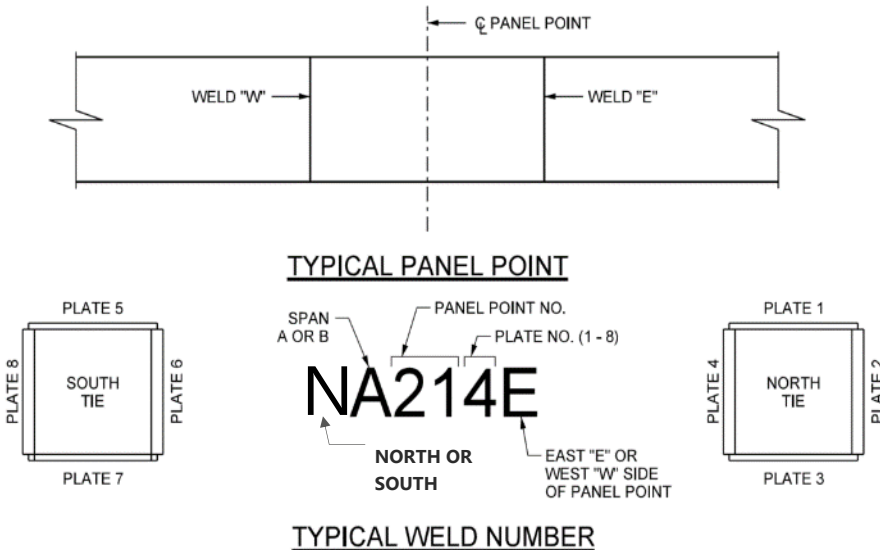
Identification of tie plates and welds (figure provided by HNTB).
